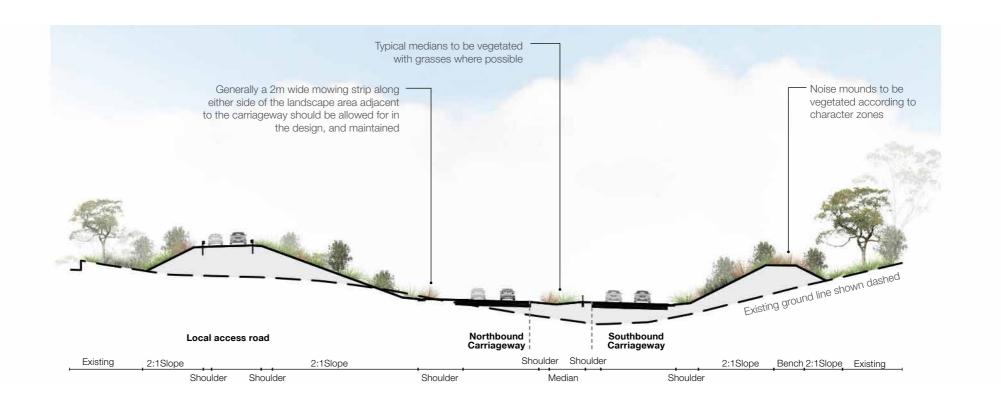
SECTION THROUGH MAIN CARRIAGEWAY WITH A TYPICAL MEDIAN - CH15350 (MCN1)
